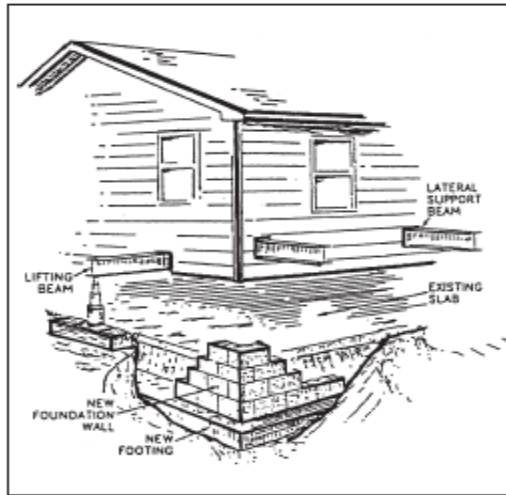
Lifting beams are placed under bearing walls and posts. The house is uniformly lifted using hydraulic jacks.
